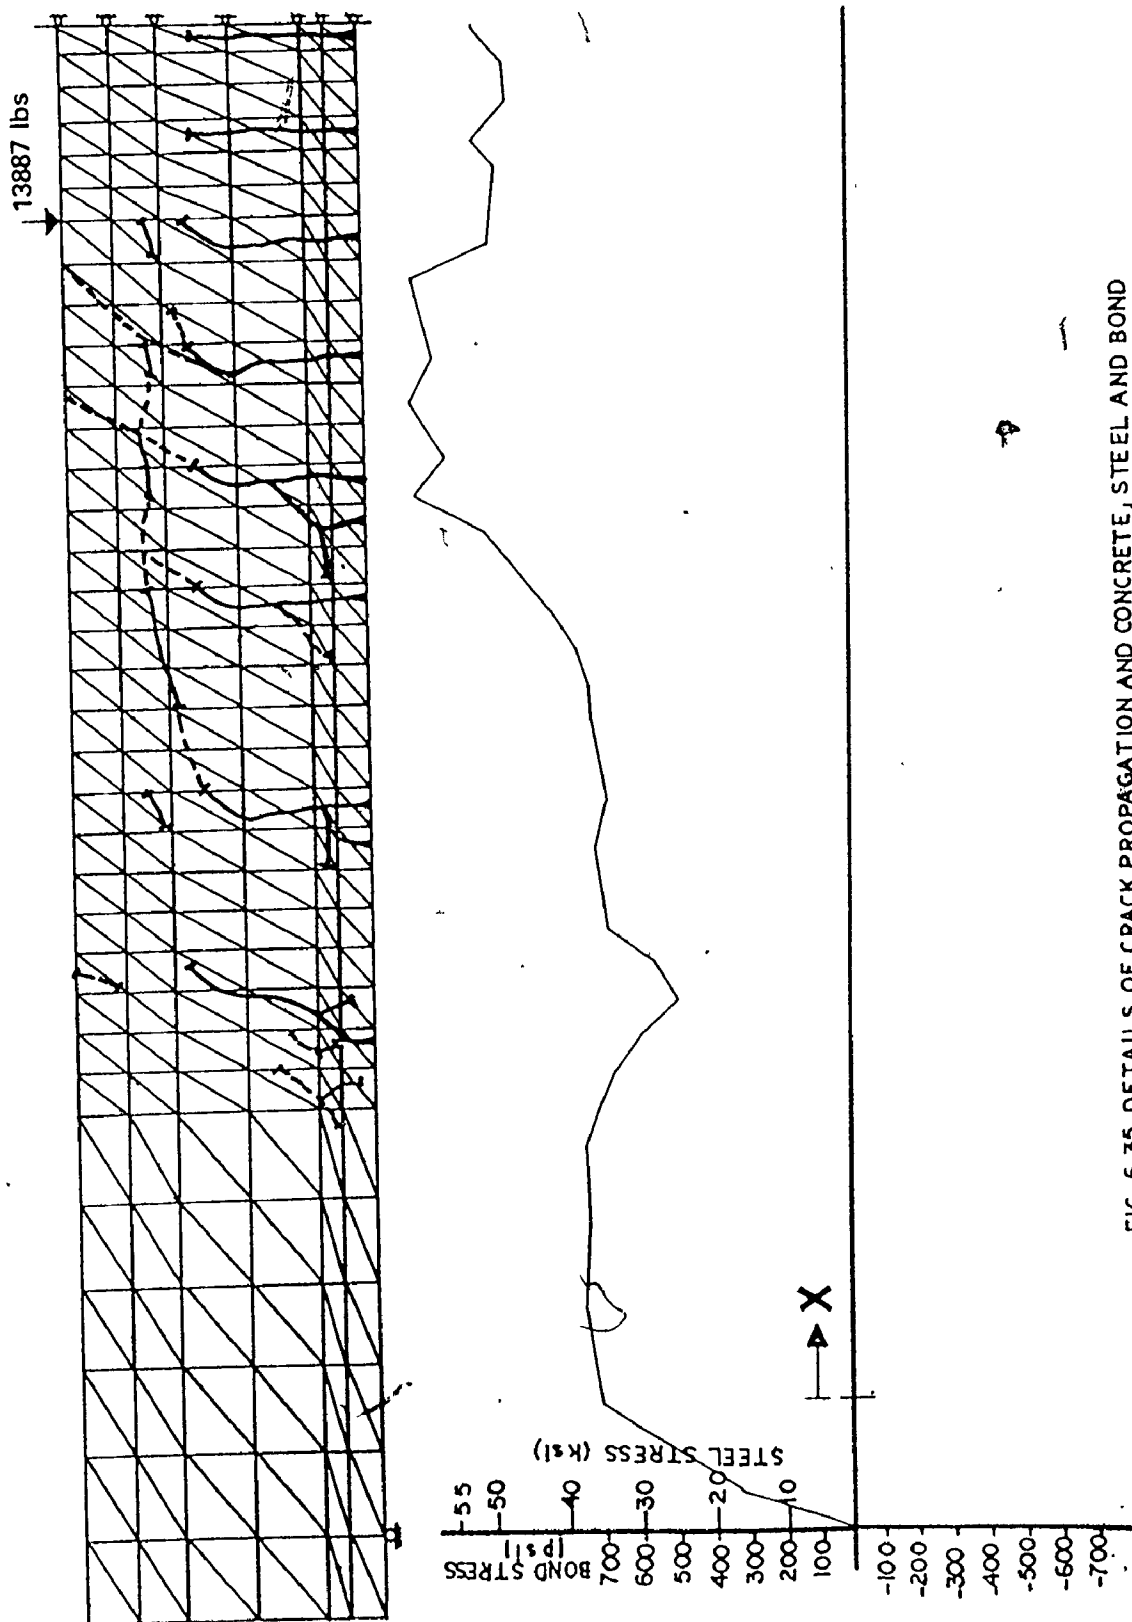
DETAILS OF CRACK PROPAGATION AND CONCRETE, STEEL AND BOND STRESS DISTRIBUTIONS FOR BEAM (7/1)
